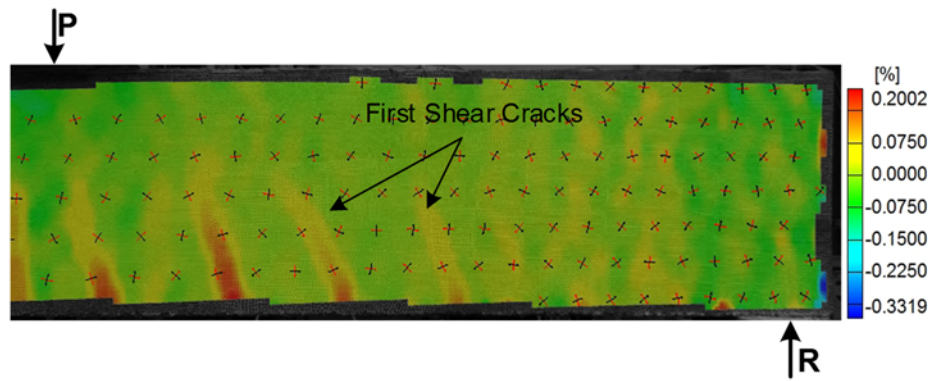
Full-field concrete longitudinal strain ( $\epsilon_x$ ) across shear span for specimen RC18b at load 22.8 kips
